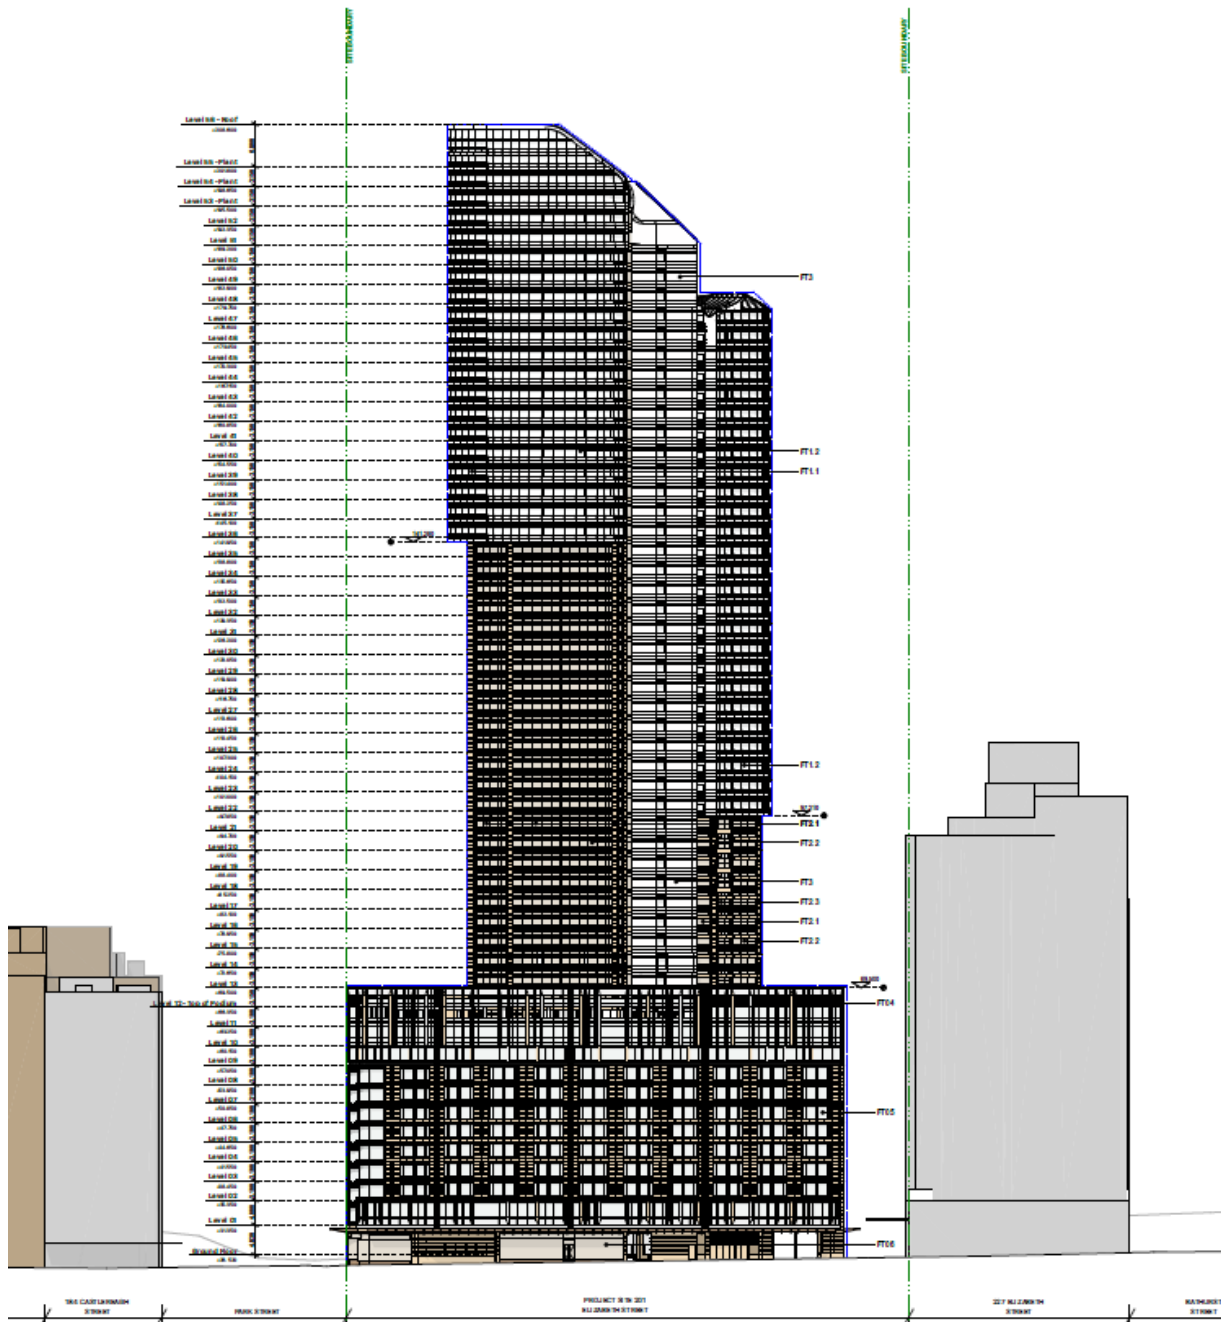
| Proposed west elevation (Source: Ethos Urban RtS amended architectural drawings)
